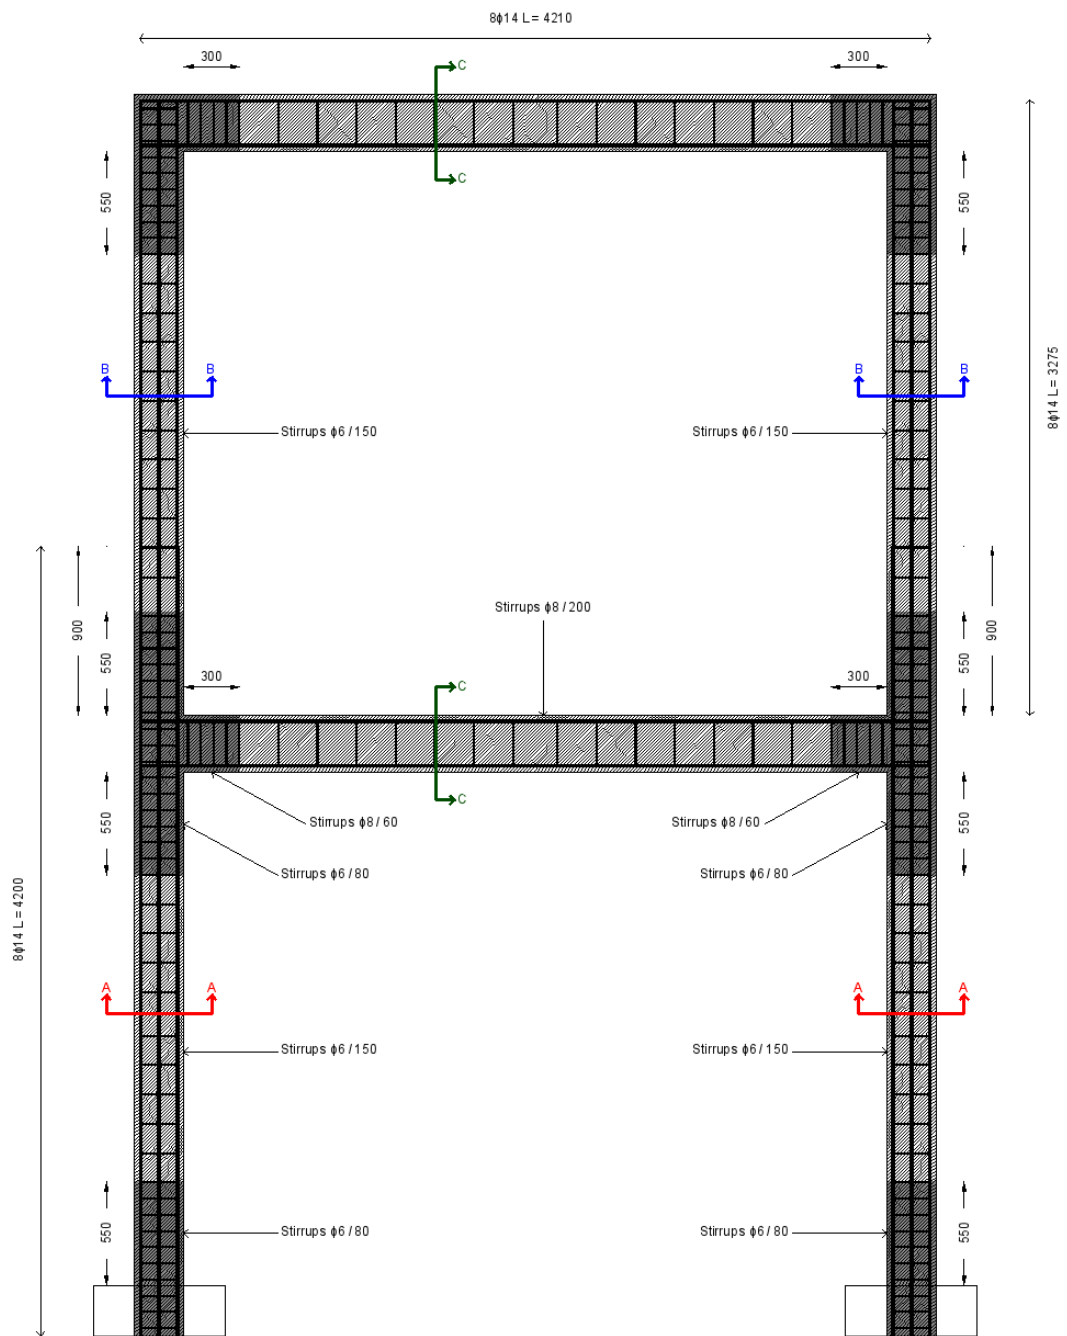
Longitudinal and transversal reinforcement in the frame (beams 300 · 260)
